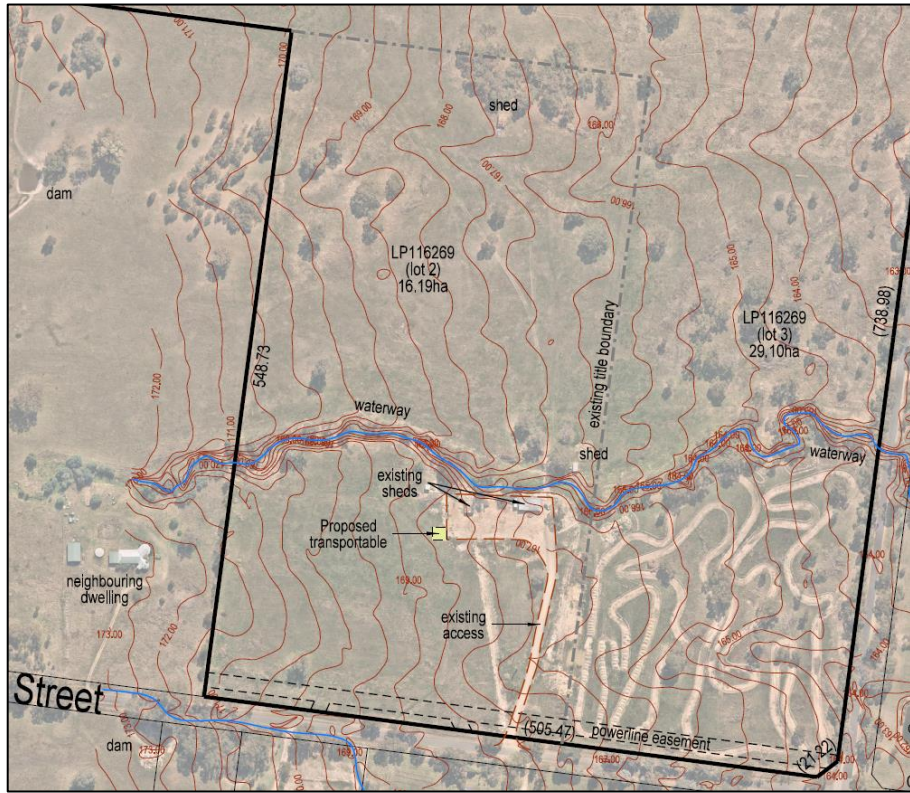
Site plan showing the proposed transportable, and existing sheds
